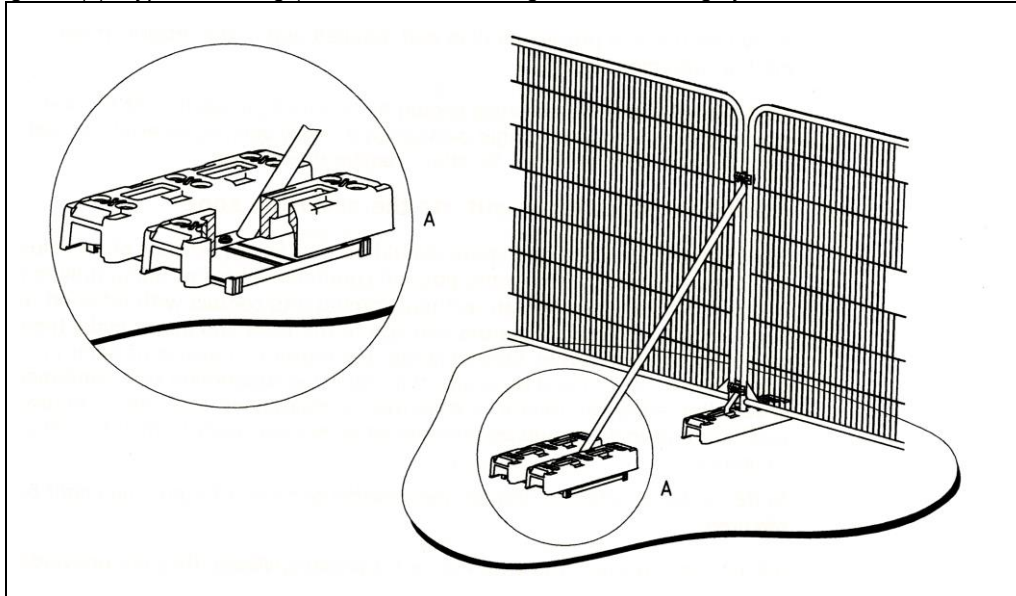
(a): Type 2 Fencing (BS5837:2012 above-ground strut stabilising system with ground pins)
